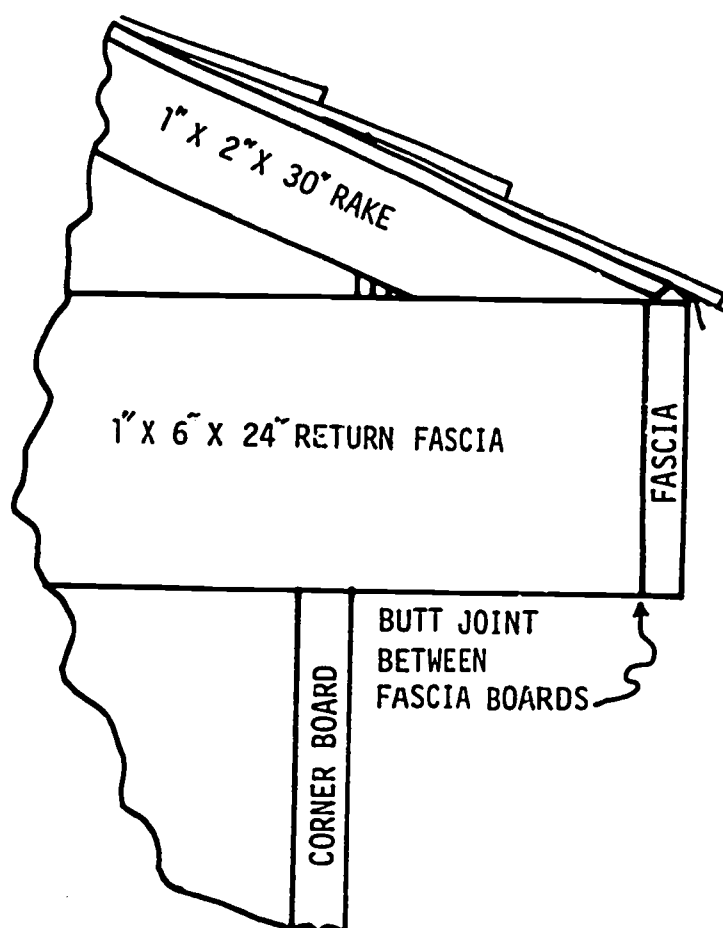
B-3. Return Fascia and Rake Are in Place on Short Wall
